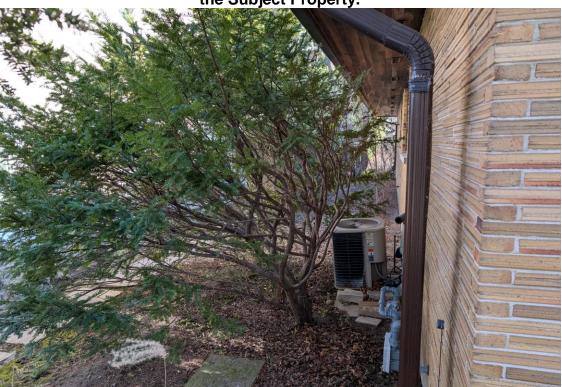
Existing side yard where the proposed dwelling will project into, existing building shown in the photo with be removed.
